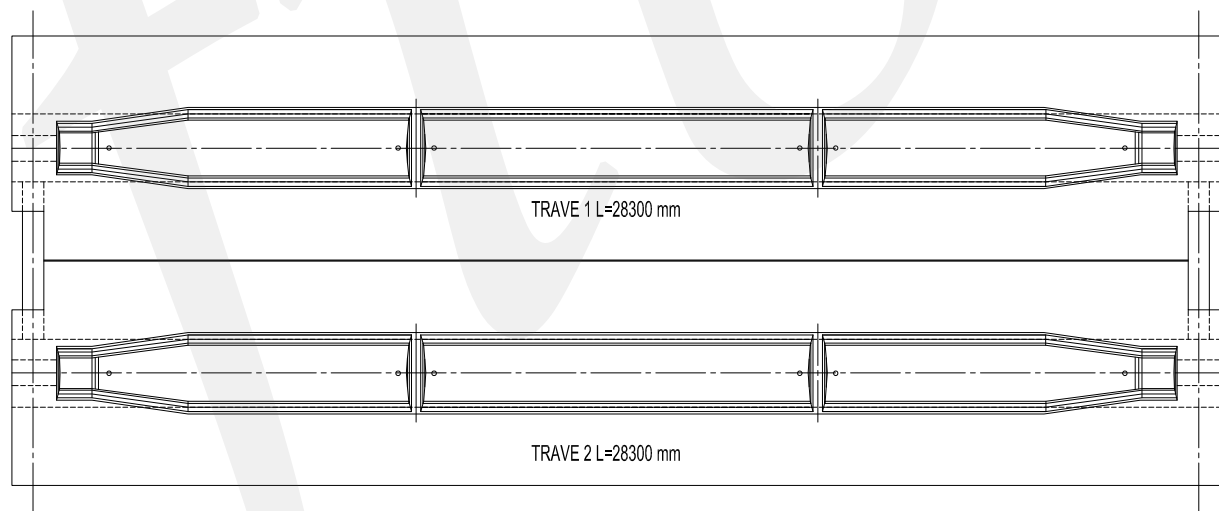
Plan of an 11.25 m (37 ft) wide bridge with two girders. Note: 1 mm = 0.0394 in.
